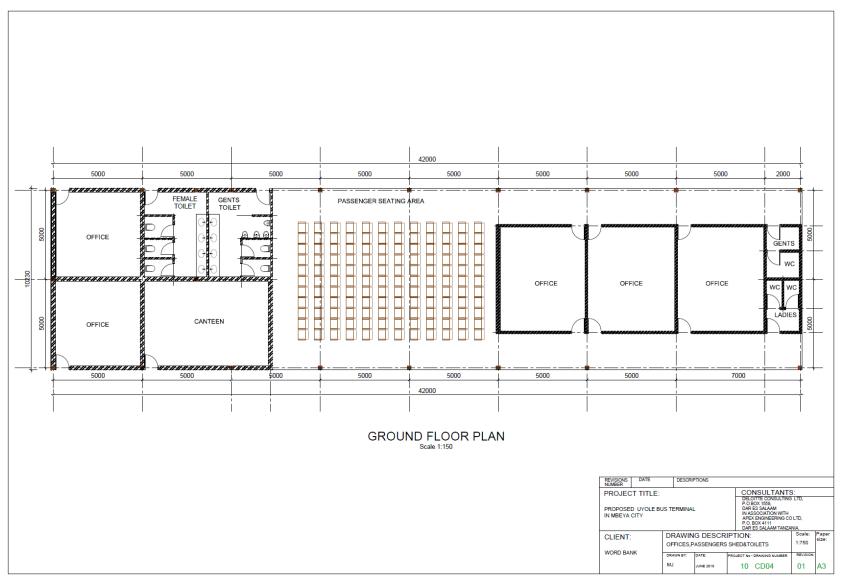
Ground Plan of Proposed Uyole Bus Terminal
